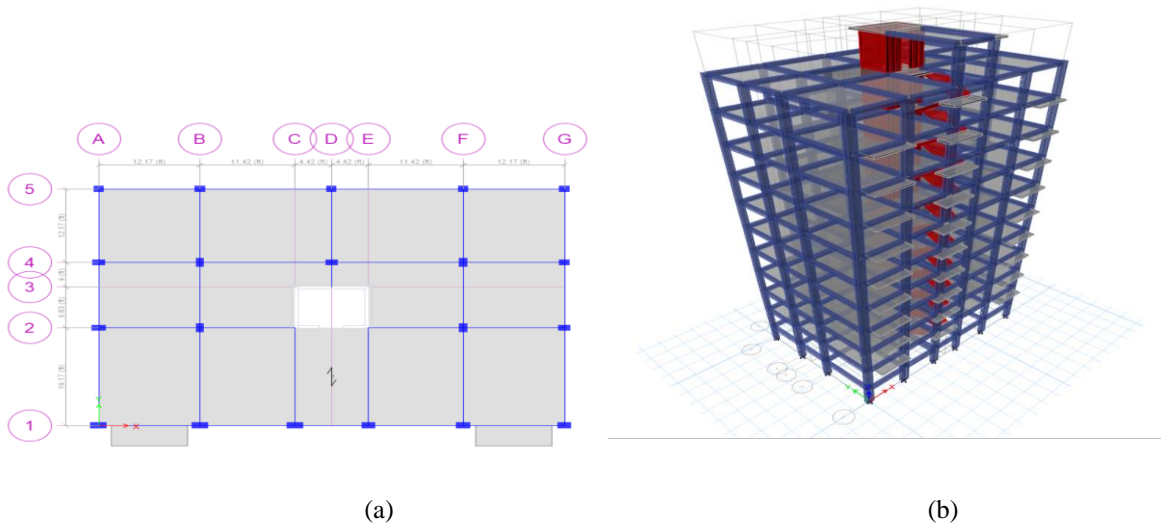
(a) Beam and column layout of RC building and (b) 3D of RC building model.
